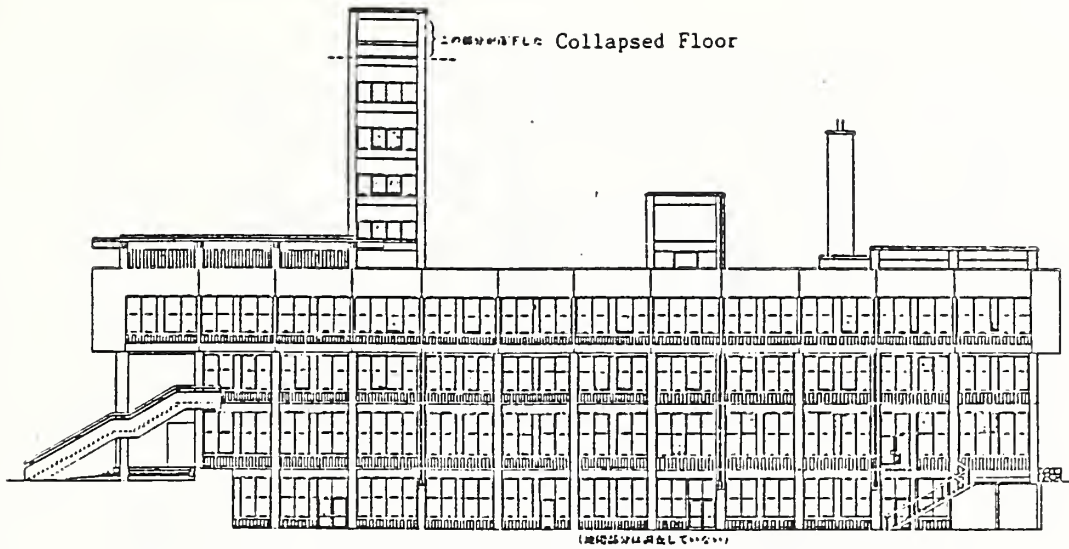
North Side Elevation of Old City Office and Damaged Windows in 1968 (Ref.4)
